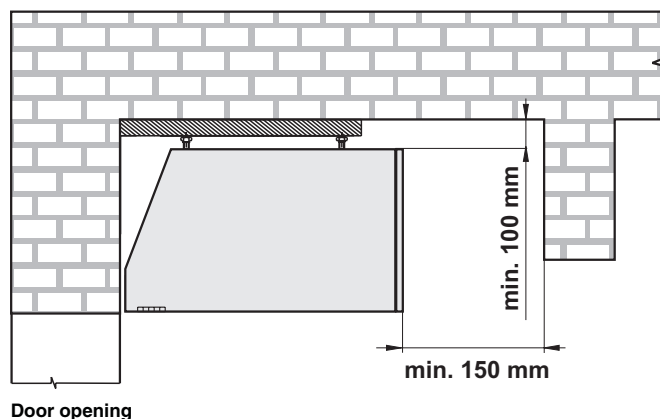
Hanging of air curtain by aid of wall bracket VCS3-SKD
